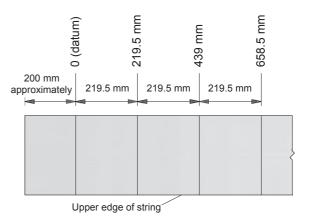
When marking the first string, establish a datum from which the steps should be marked.
